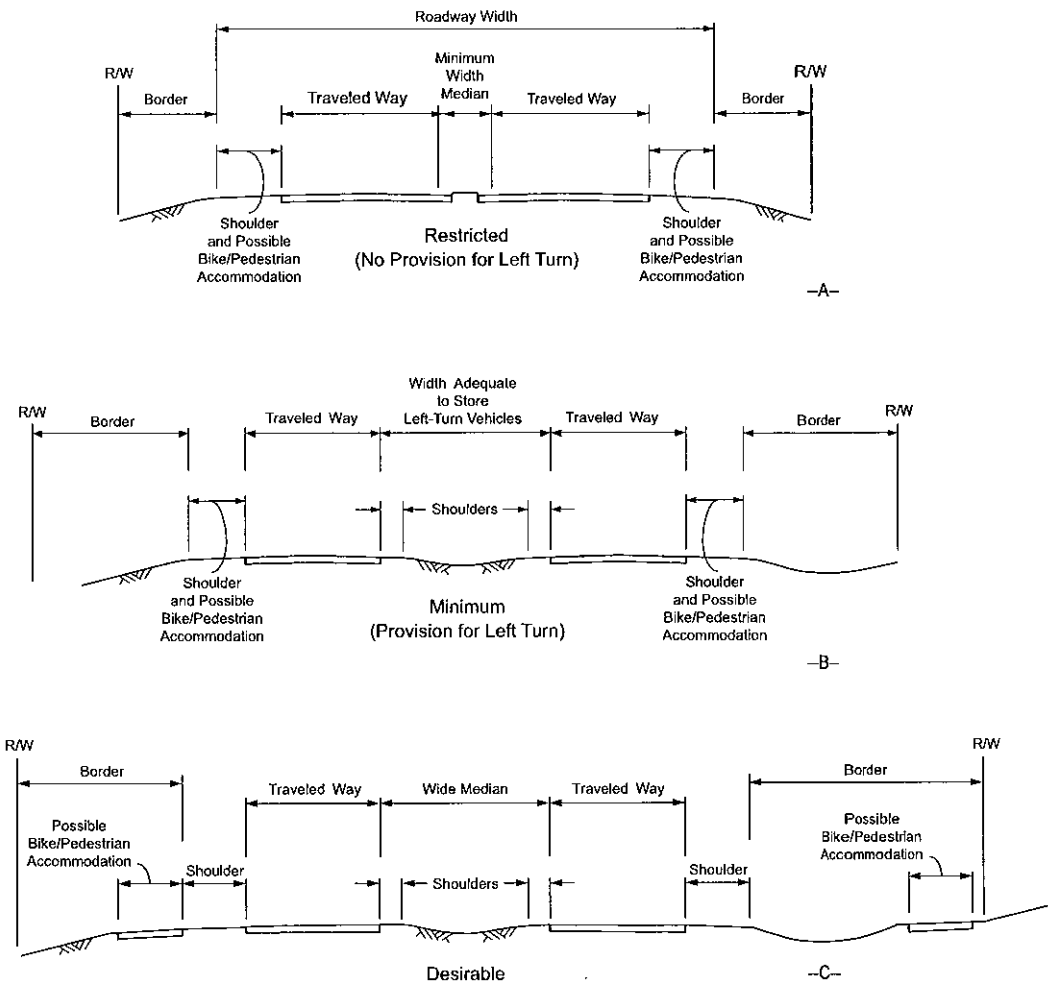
Cross Sectional Arrangements on Divided Arterials in Rural Areas
